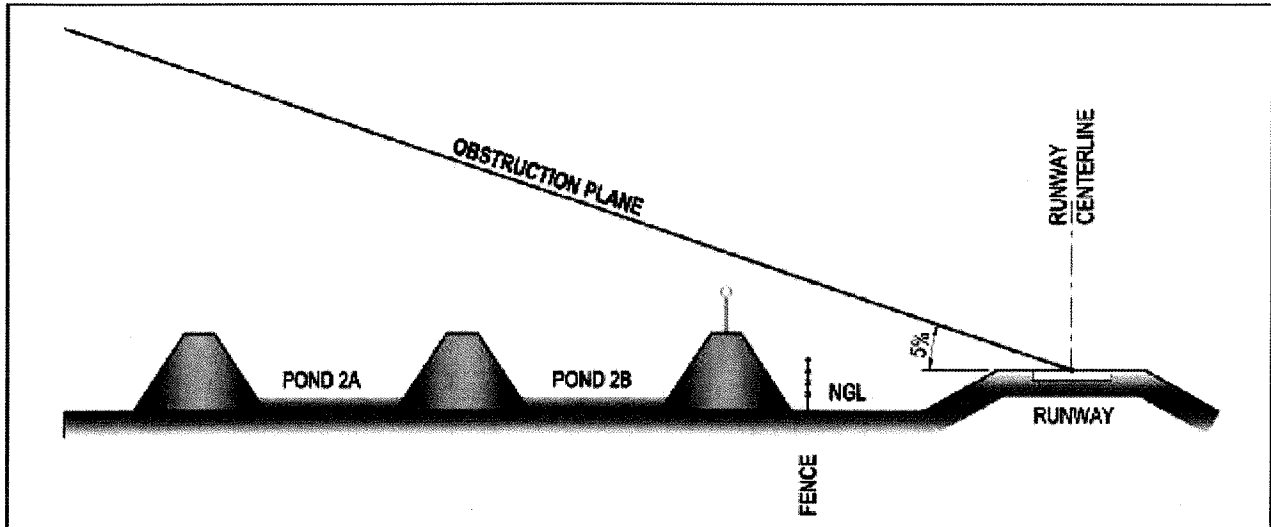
Civil Aviation wall height restrictions and lighting requirements
